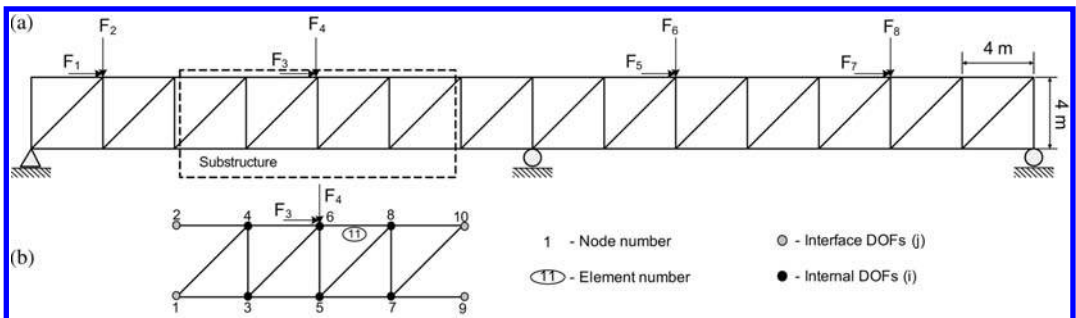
Long-span truss structure: (a) full structure; (b) substructure.
